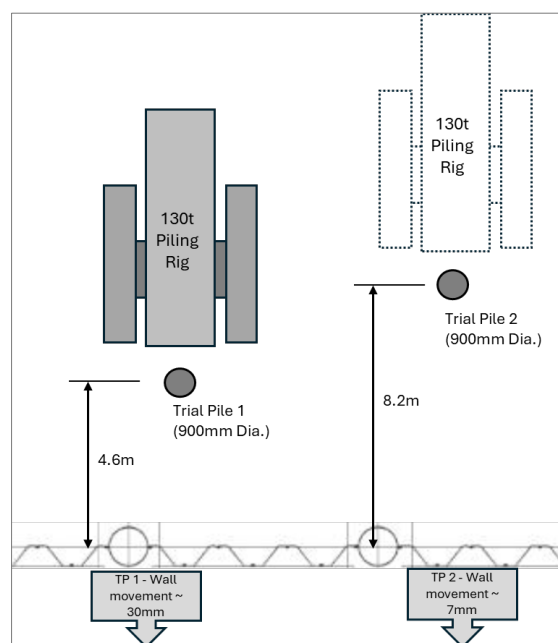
Arrangement of CFA trial piles installed through Coode Island Silt adjacent to retaining wall.
